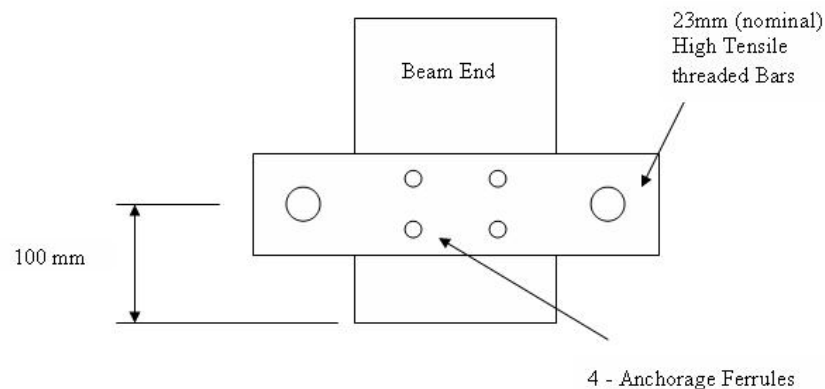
Cross Section of the Anchorage Plates and Prestressing Bars
